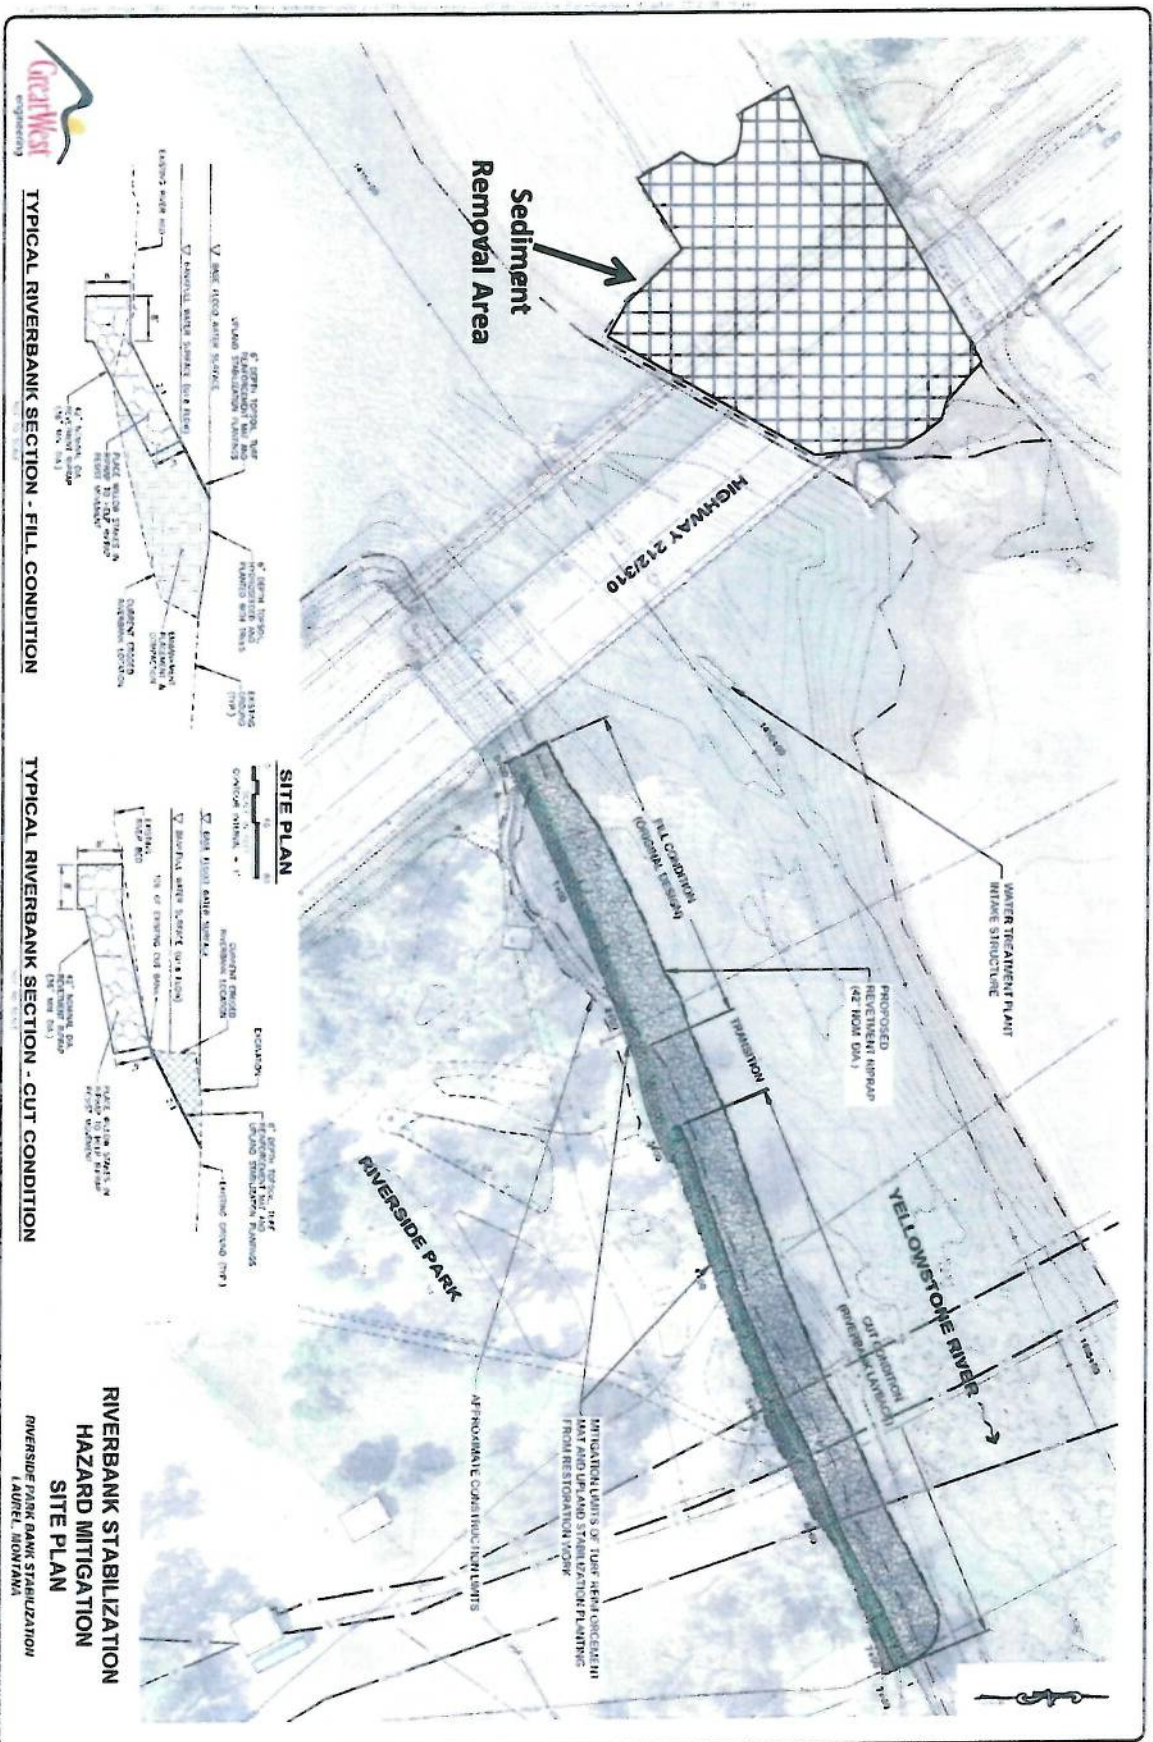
Exhibit C – Bank Stabilization Plan with Sediment Removal Area
